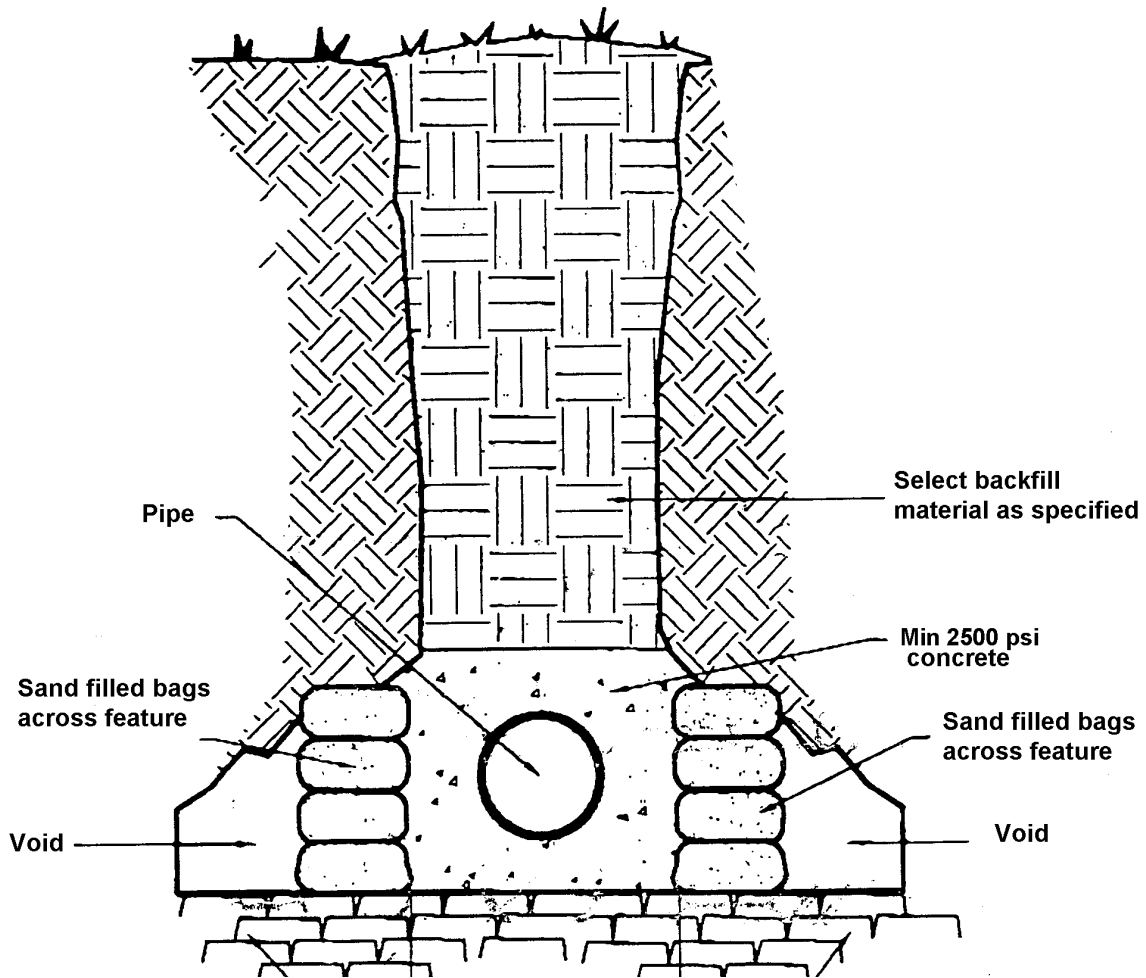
Example of Filled Void in Trench Excavation (courtesy Donald Bayes)
